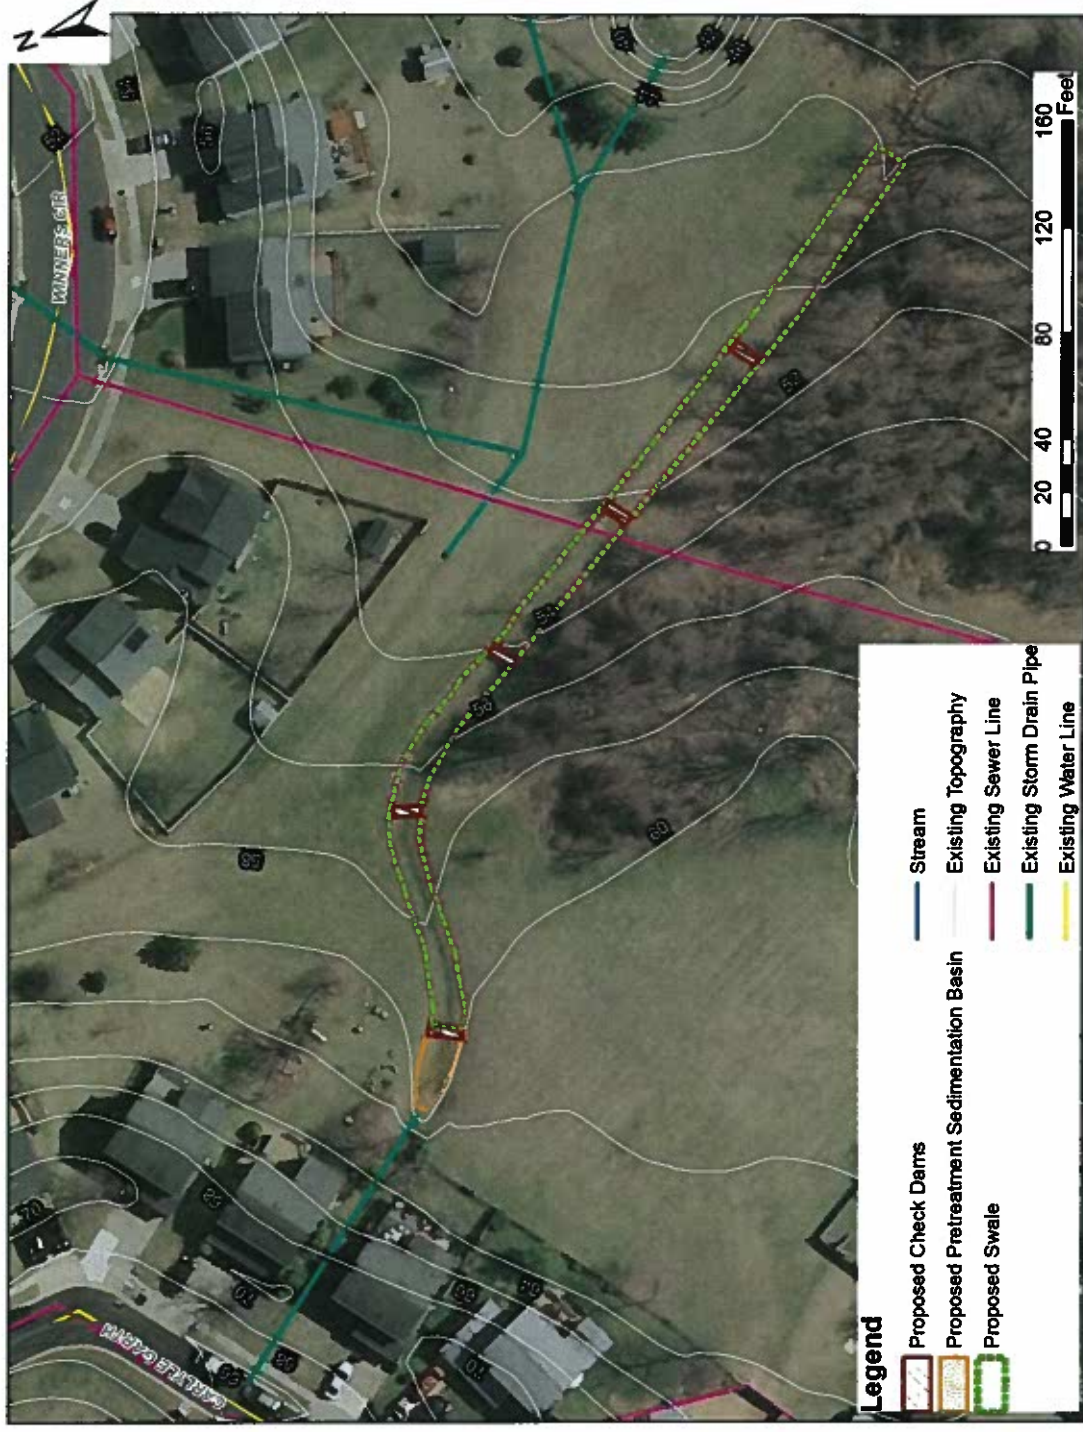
Proposed structural stormwater improvement at site R-NS-8
